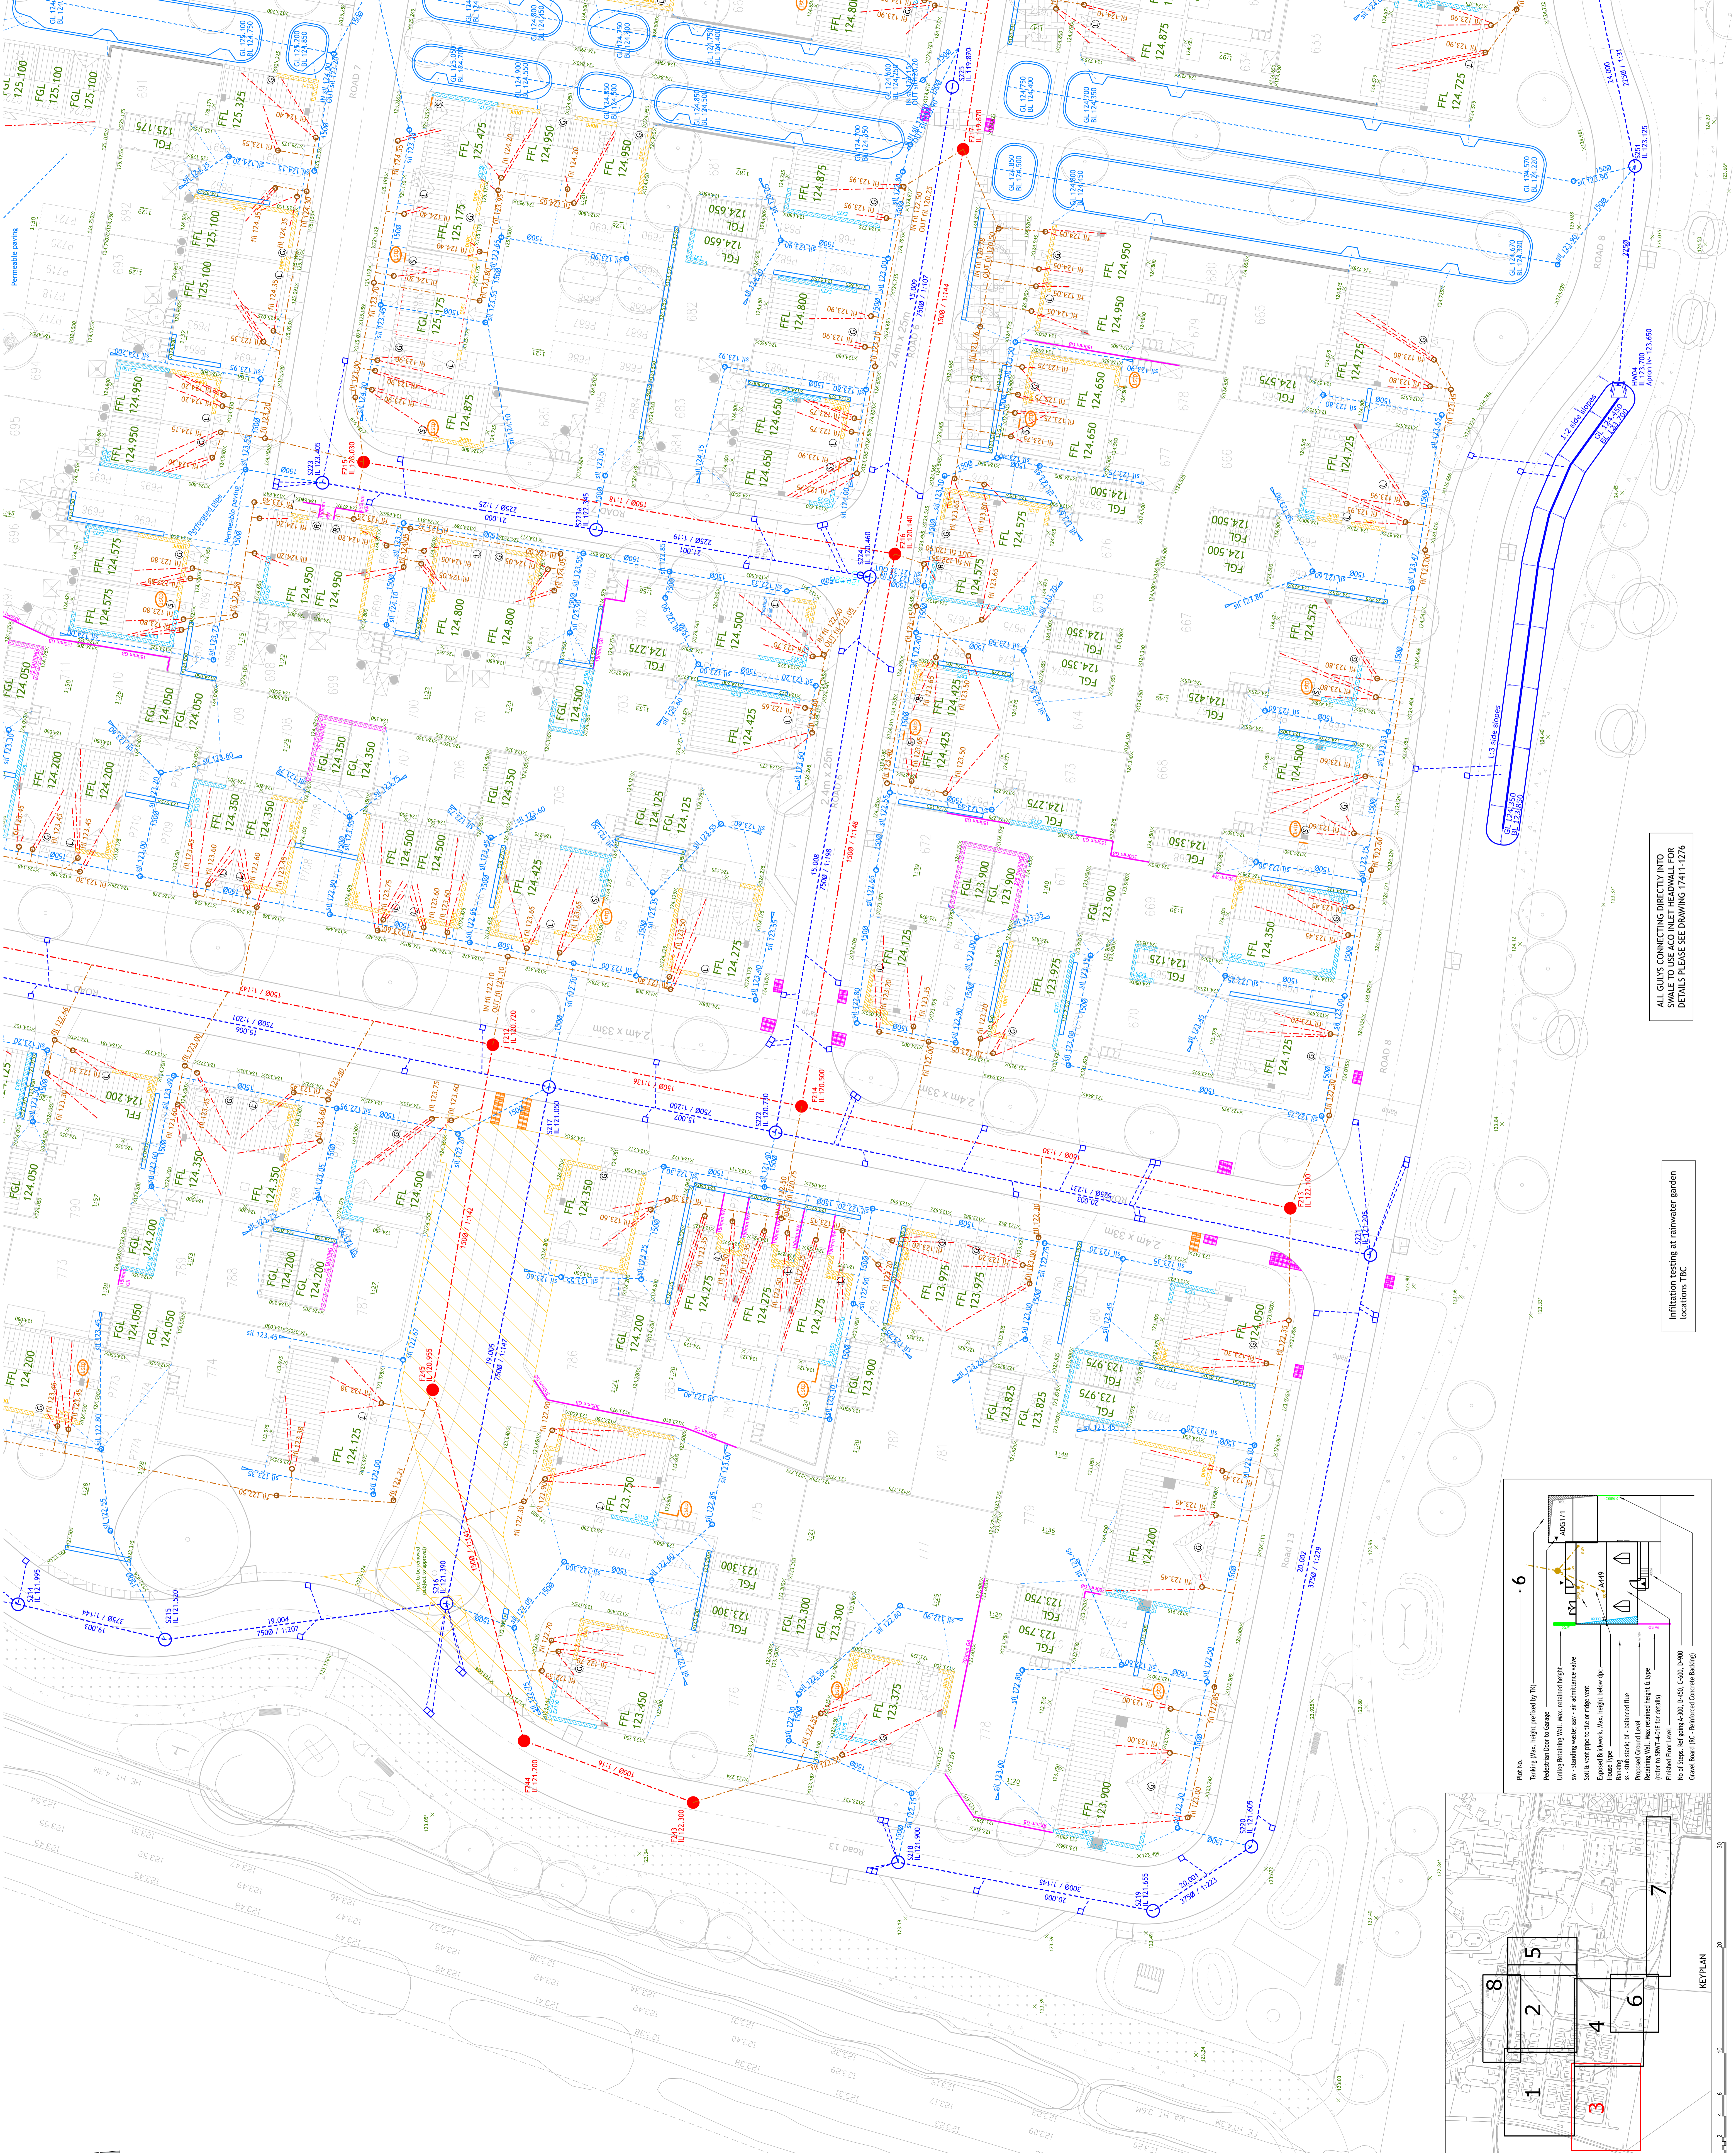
ENGINEERING LAYOUT SHEET 3
